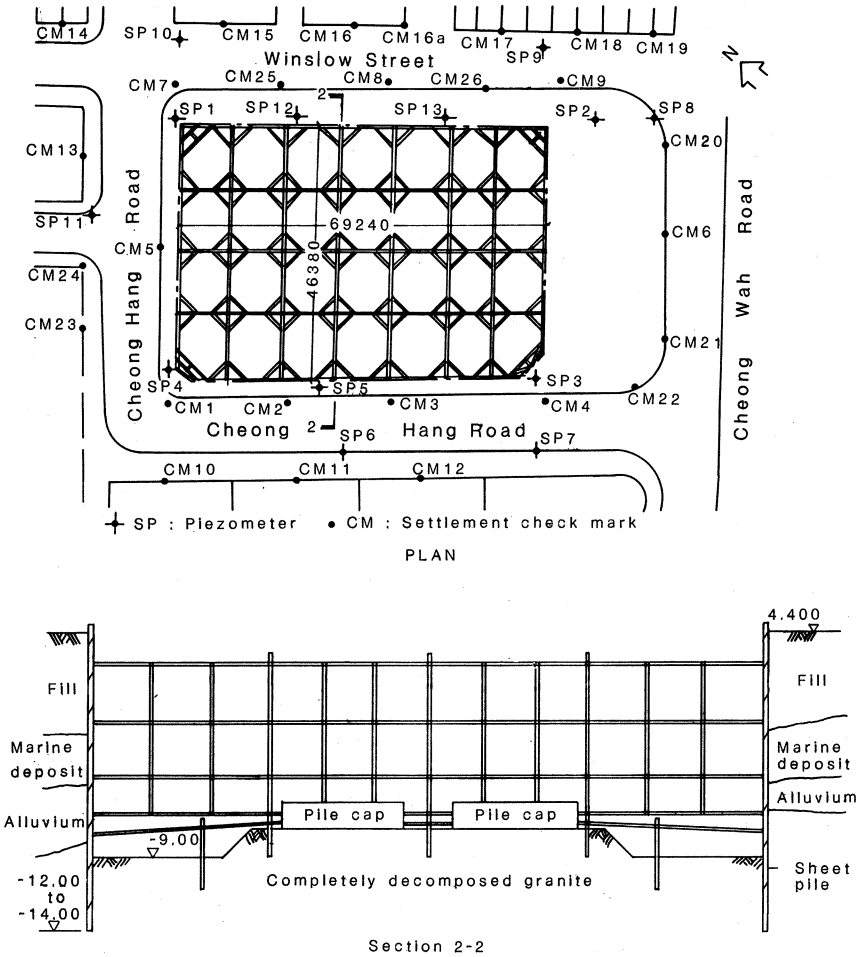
Shoring and Monitoring System used at Hung Hom Site.
